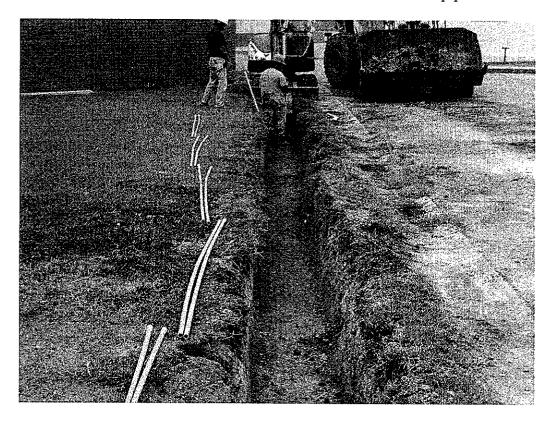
Phase II – Excavation and marker layer for Electrical Conduit Installation.
